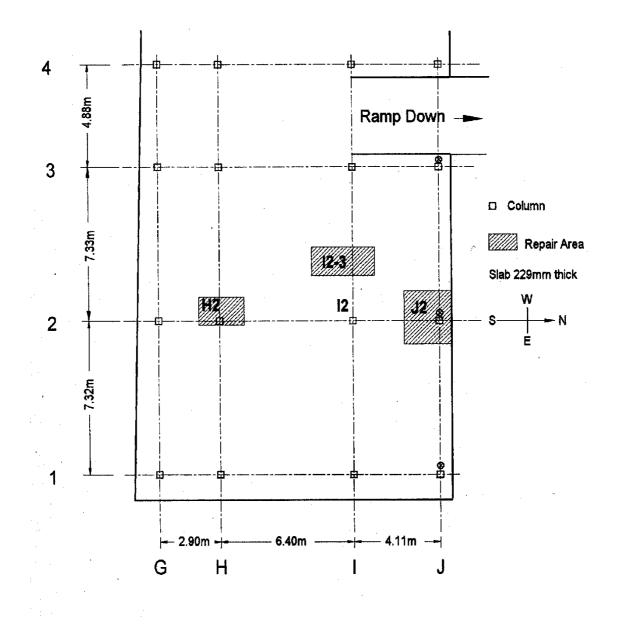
1 Plan of 4th floor slab at Pipers Row showing repaired areas
